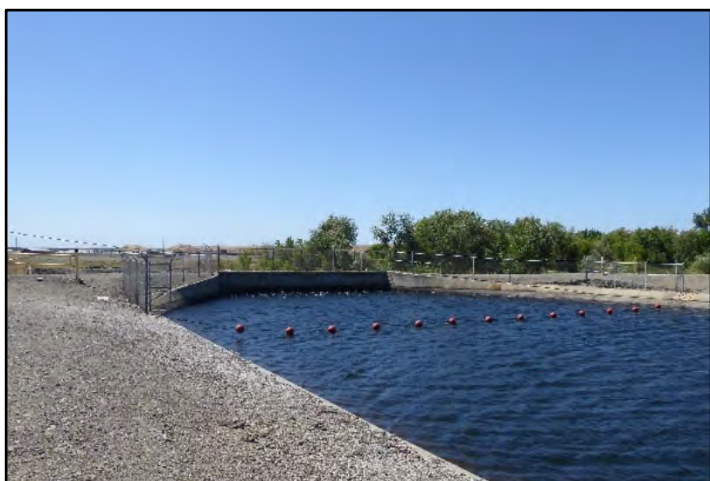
Detail view of Check No. 9 from the deck of Diehl Road Bridge; camera facing downstream from left bank, May 13, 2022 (A00883).
